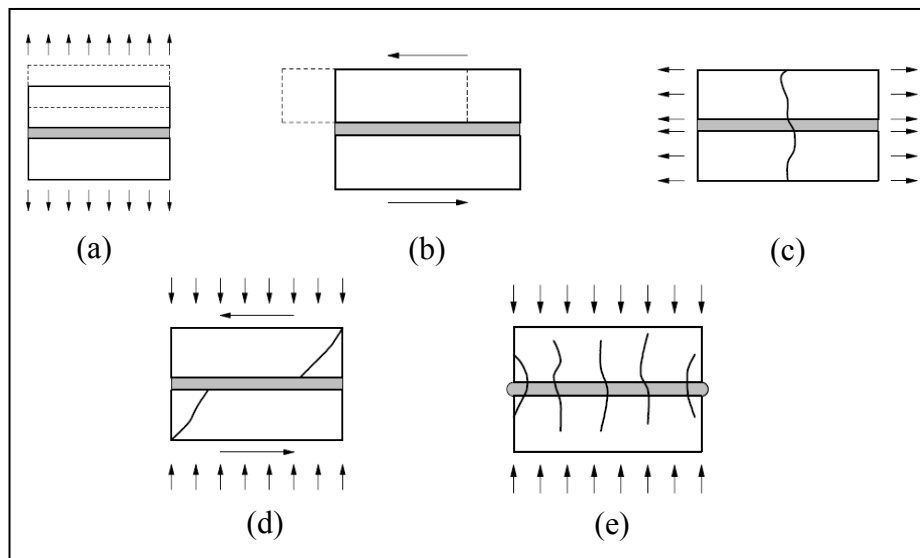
Failure modes of masonry: (a) joint tensile failure; (b) joint slipping failure; (c) unit tensile failure; (d) unit diagonal tensile cracking failure; (e) masonry crushing (redrawn after Lourenço et al. (1998))
